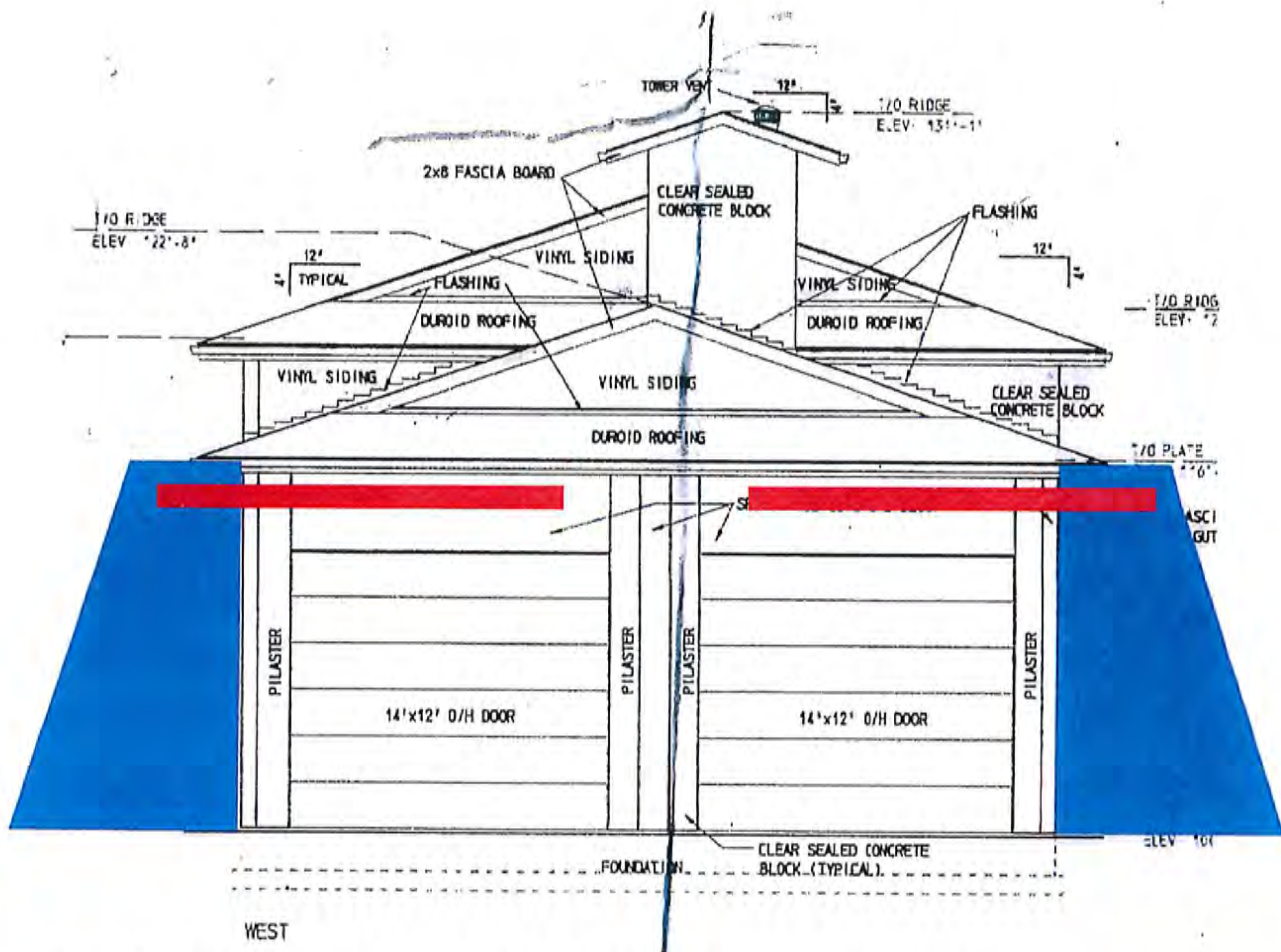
New Reinforced concrete buttress walls at each side of the truck bays door complete with steel drag strut elements
